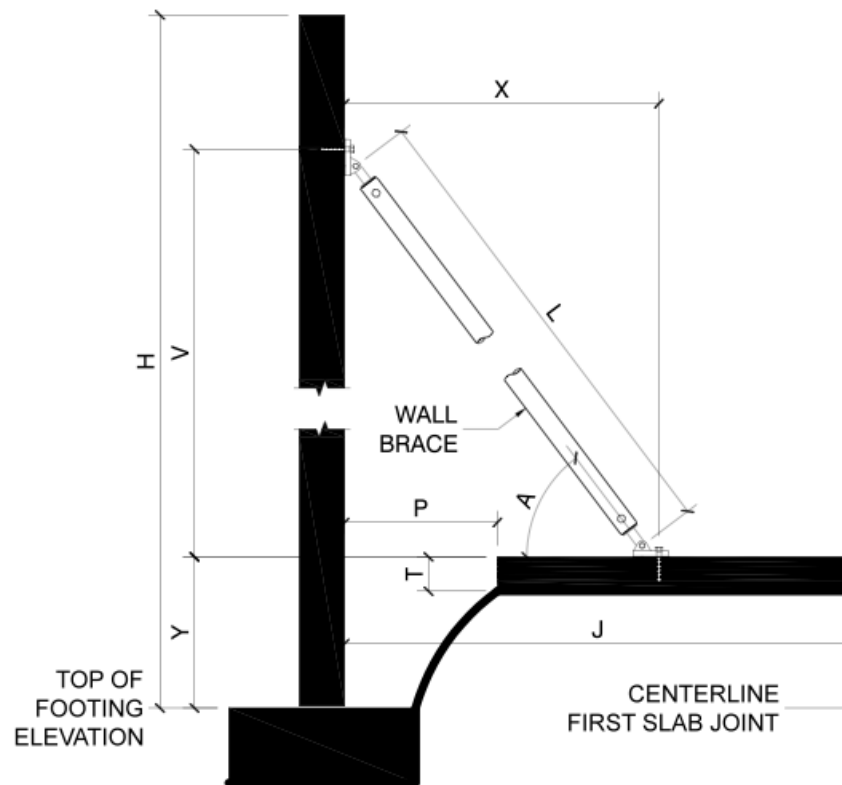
Section Cut of Tilt-Up Concrete Panel with Slab on Grade Brace Anchorage (Reproduced from Steinbicker, 2018)
